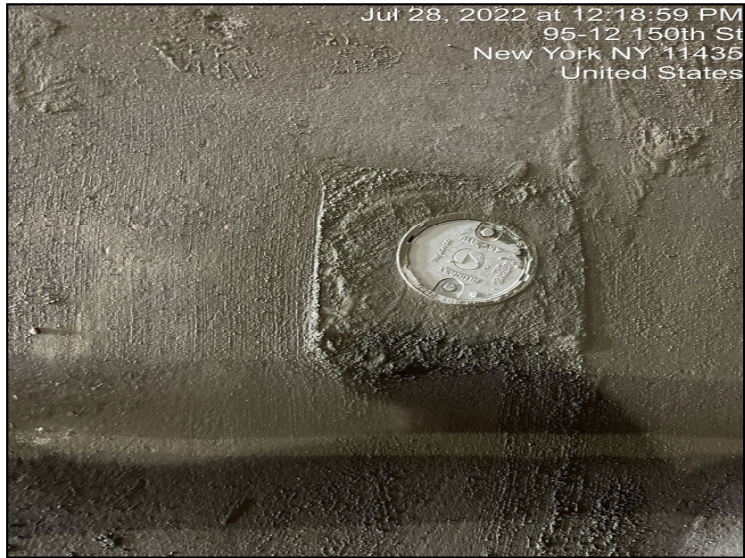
Open floor drain prior in Lot 10 prior to collection of sample RI-SB-DRAIN.
